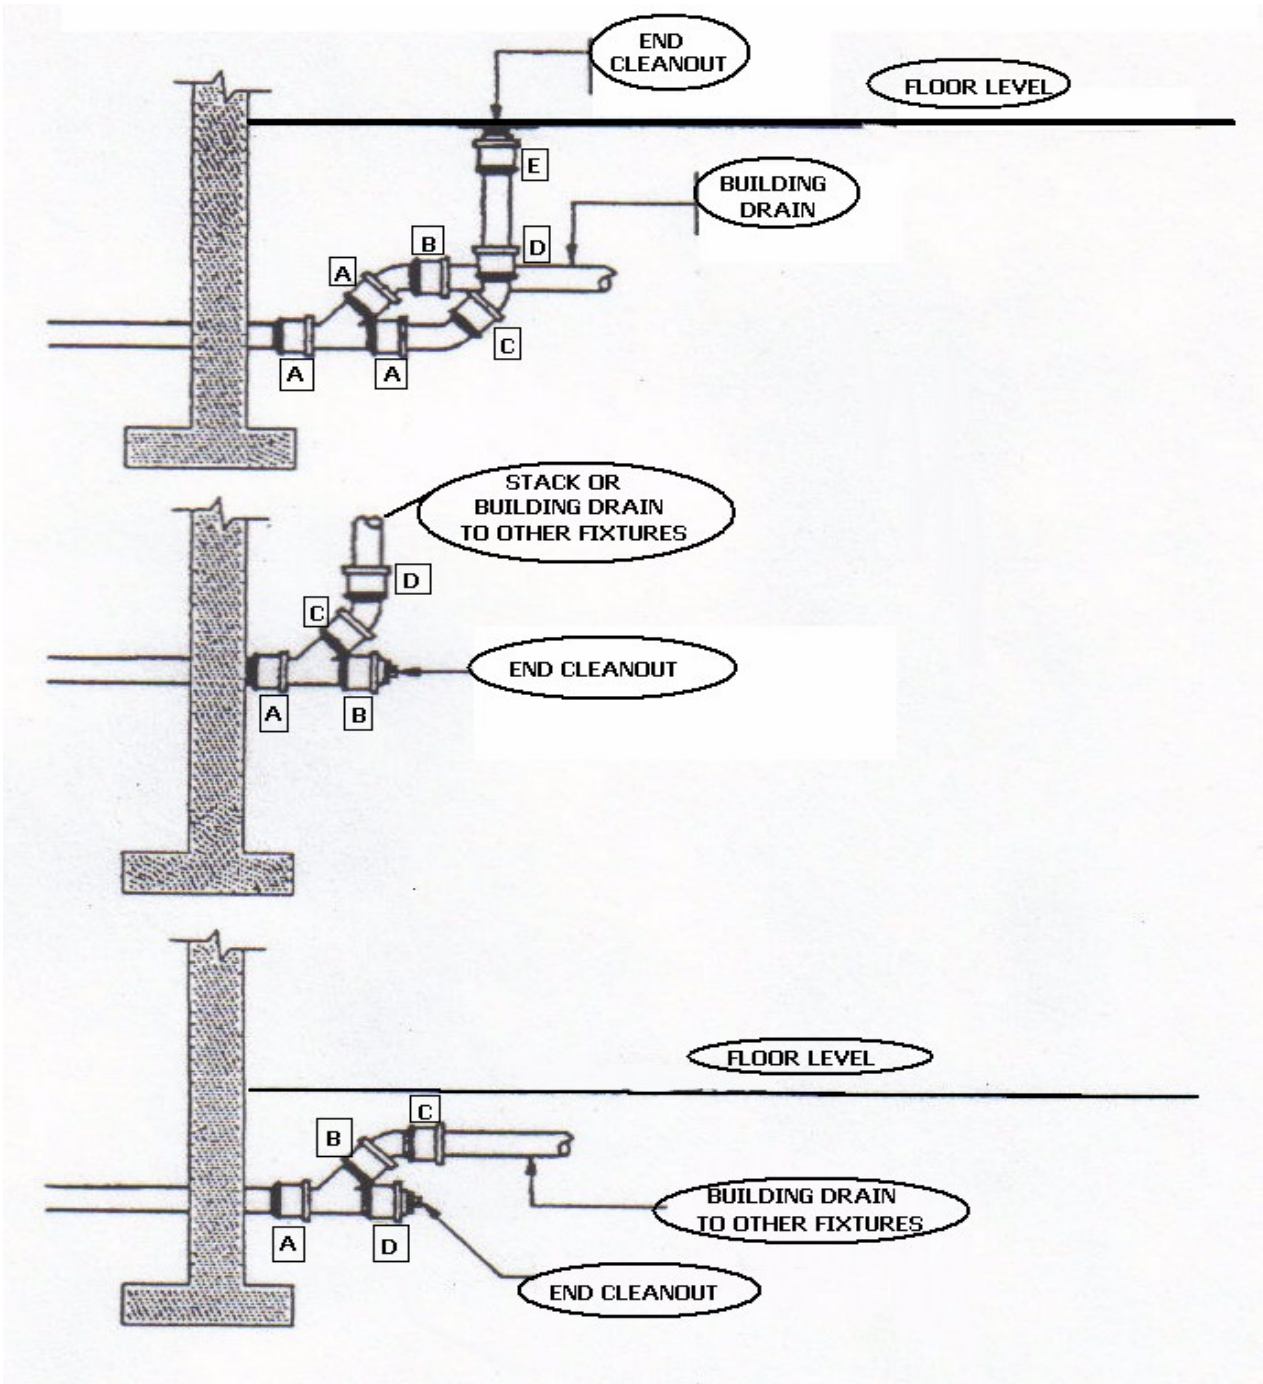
Illustrations of Building Drainage Foundation Wall.
